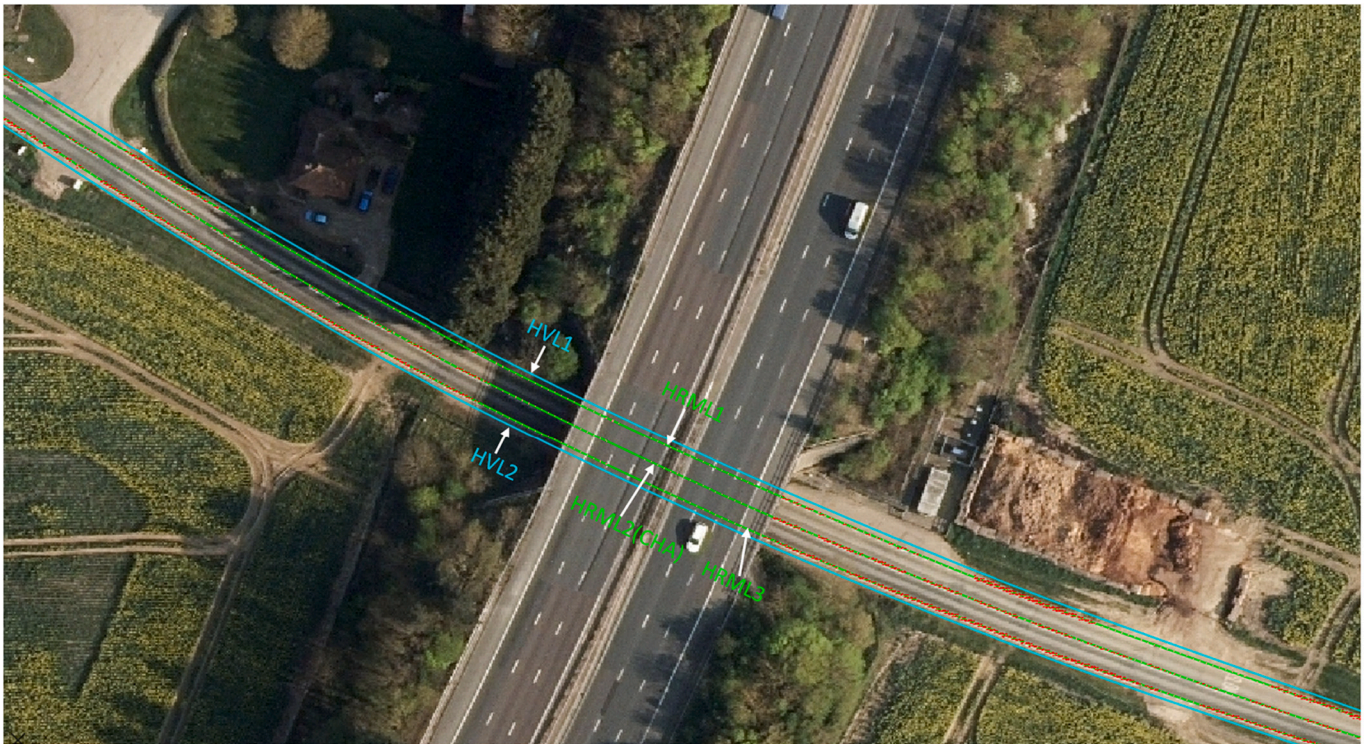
Horizontal alignment fitting of the existing low-level underpass road.
